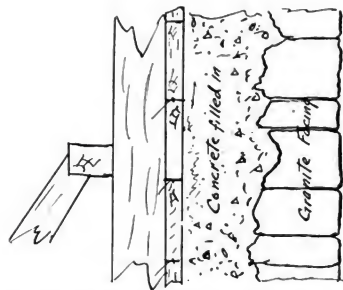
DETAIL SECTION SHOWING GRANITE FACING AND CONCRETE BACKING.
